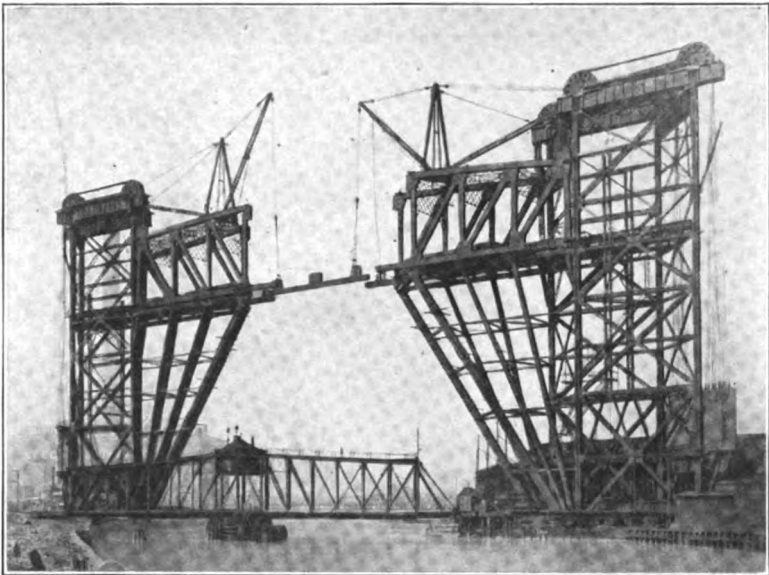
Center Section of Bottom Chord of Lift Span Being Swung into Position.
